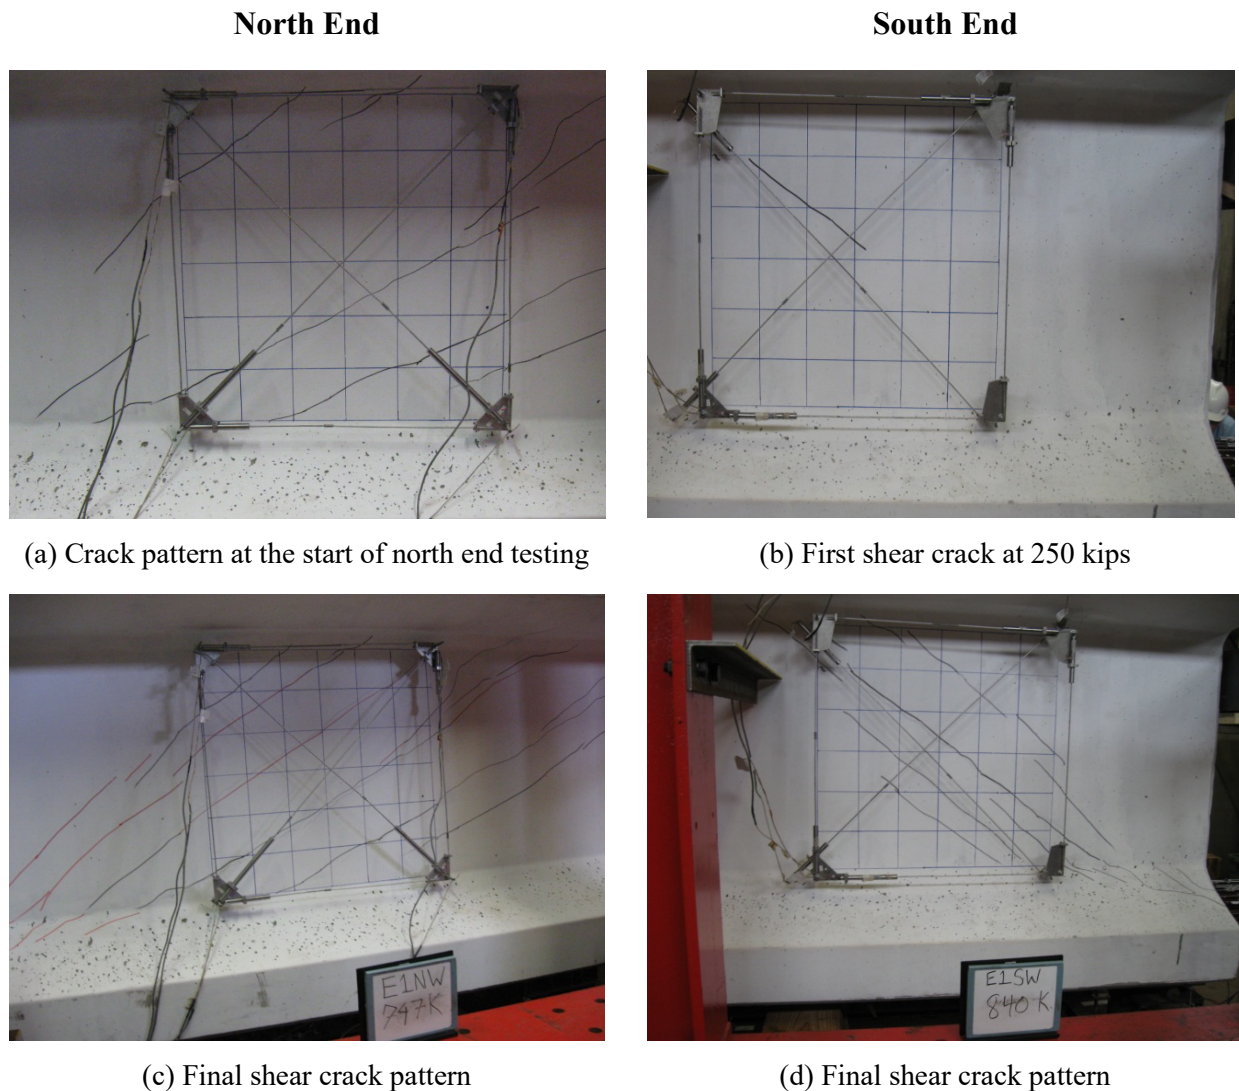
Shear Crack Pattern and Failure Mode of Girder E1
